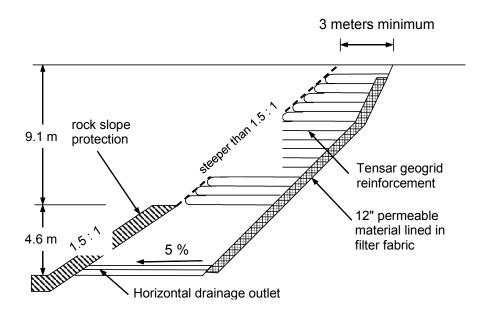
Cross section of La Honda reinforced slope (Collin et al. 1992)
